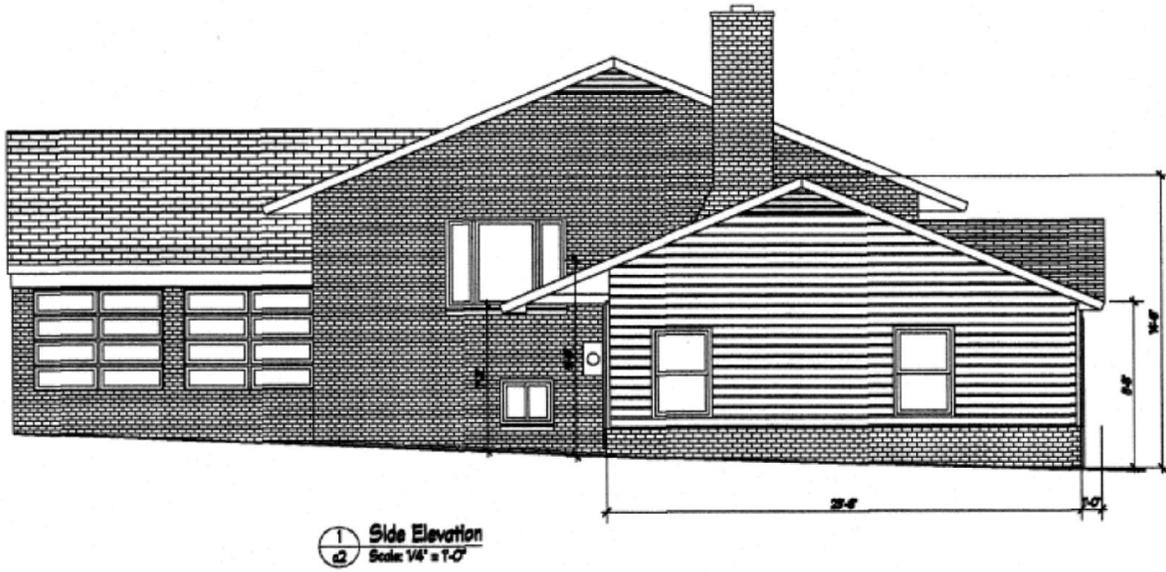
Side-view rendering of proposed garage and existing yard view. Source: Applicant.
